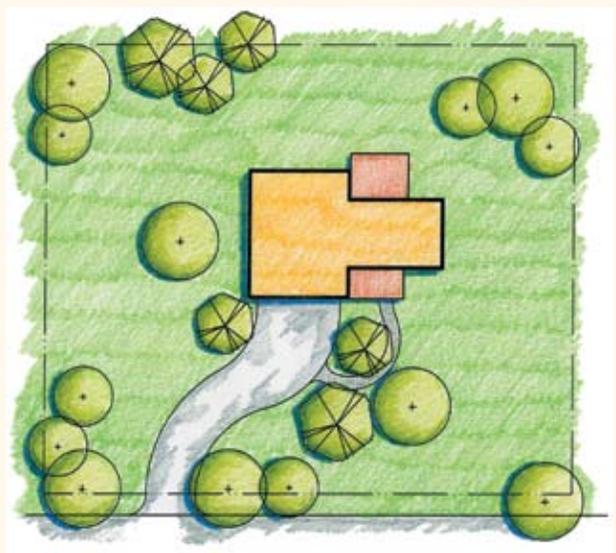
By mirroring the floorplan and repositioning house slightly, all trees could be saved in this scenario.
